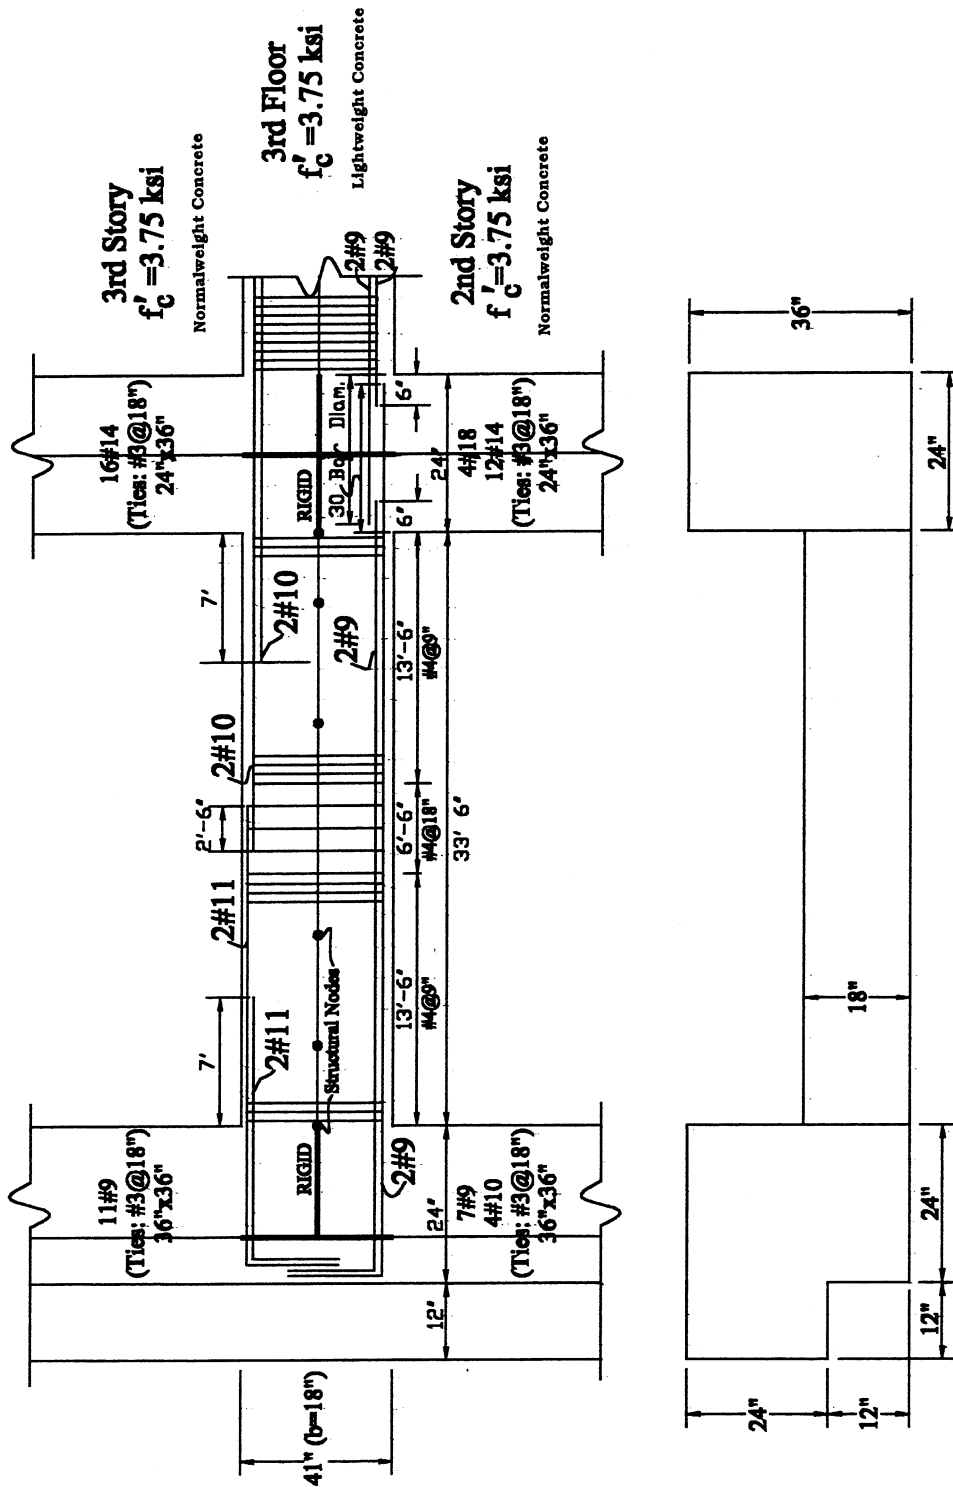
Reinforcement details for the 3<sup>rd</sup> to 5<sup>th</sup> floor beams of exterior transverse frames.
